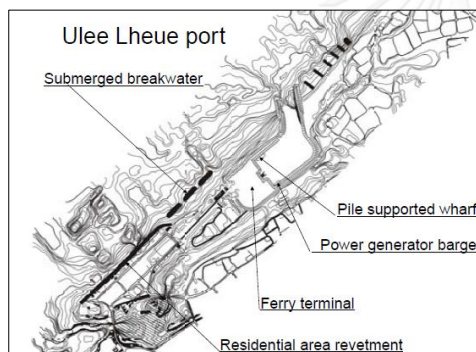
Plan of Ulee Lheue Port (PIANC 2009)
